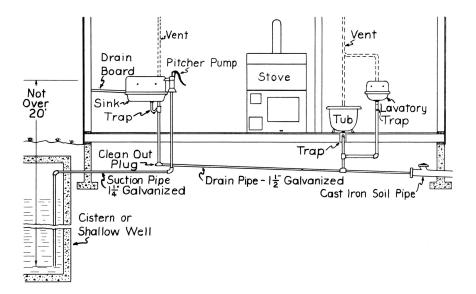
A bath tub and lavatory may be installed and connected to the sink drain.
